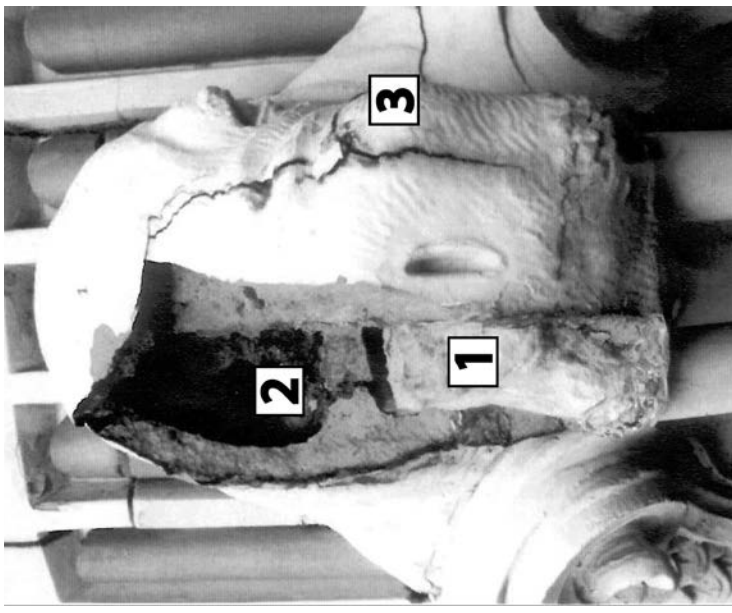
1996 inspection photo of walrus head S-1. Note the white grout sections filling the sinus cavity area of the walrus head (1). This meant there was no space left for the grout to expand into when the gypsum got wet. Note also the crack in the internal webbing (2). The damage to the internal structure of the head was so severe that this head had to be replaced. Note the cracks radiating from the dot on the top right of the walrus snout (3). This dot is the injection point for the 1982 grout installation and created a weak point in the terra cotta. (Credit: Morden & Slaton, WJE.)
